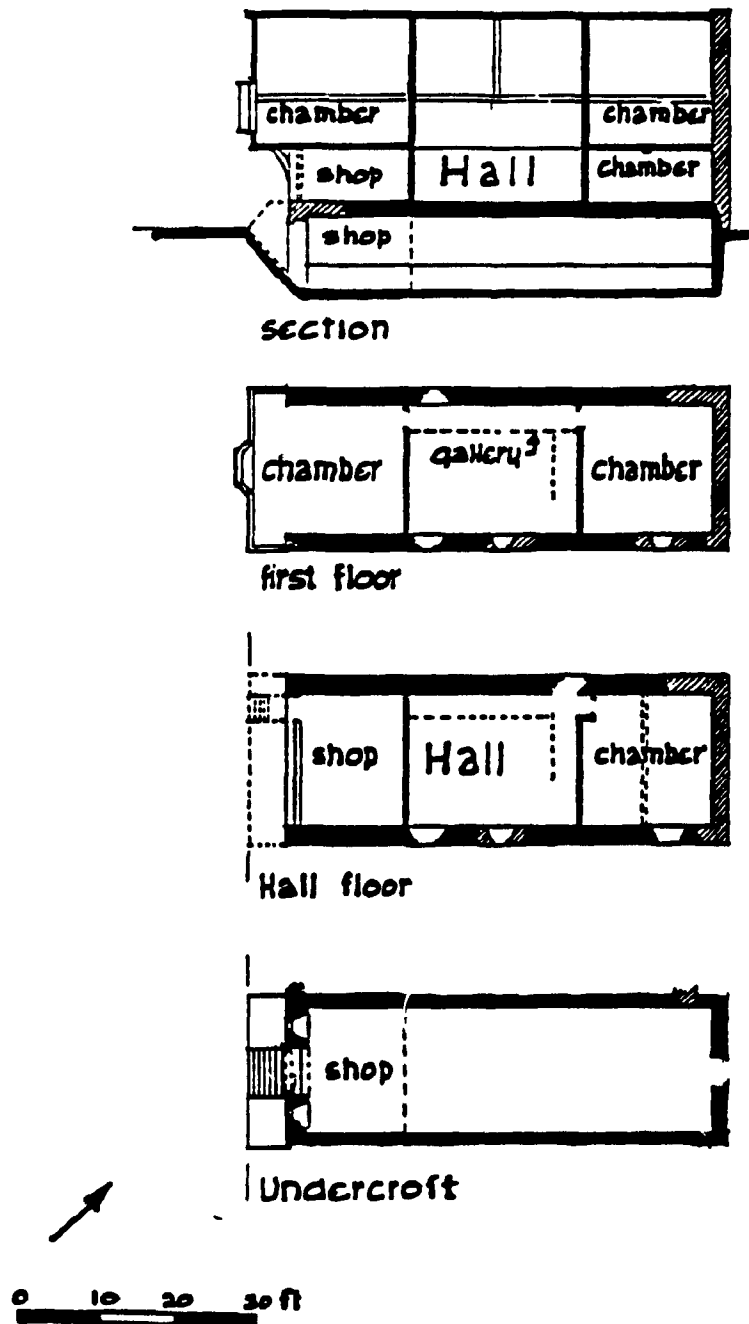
Plans and Section of a mixed use Medieval dwelling on narrow site in Southampton, England.
